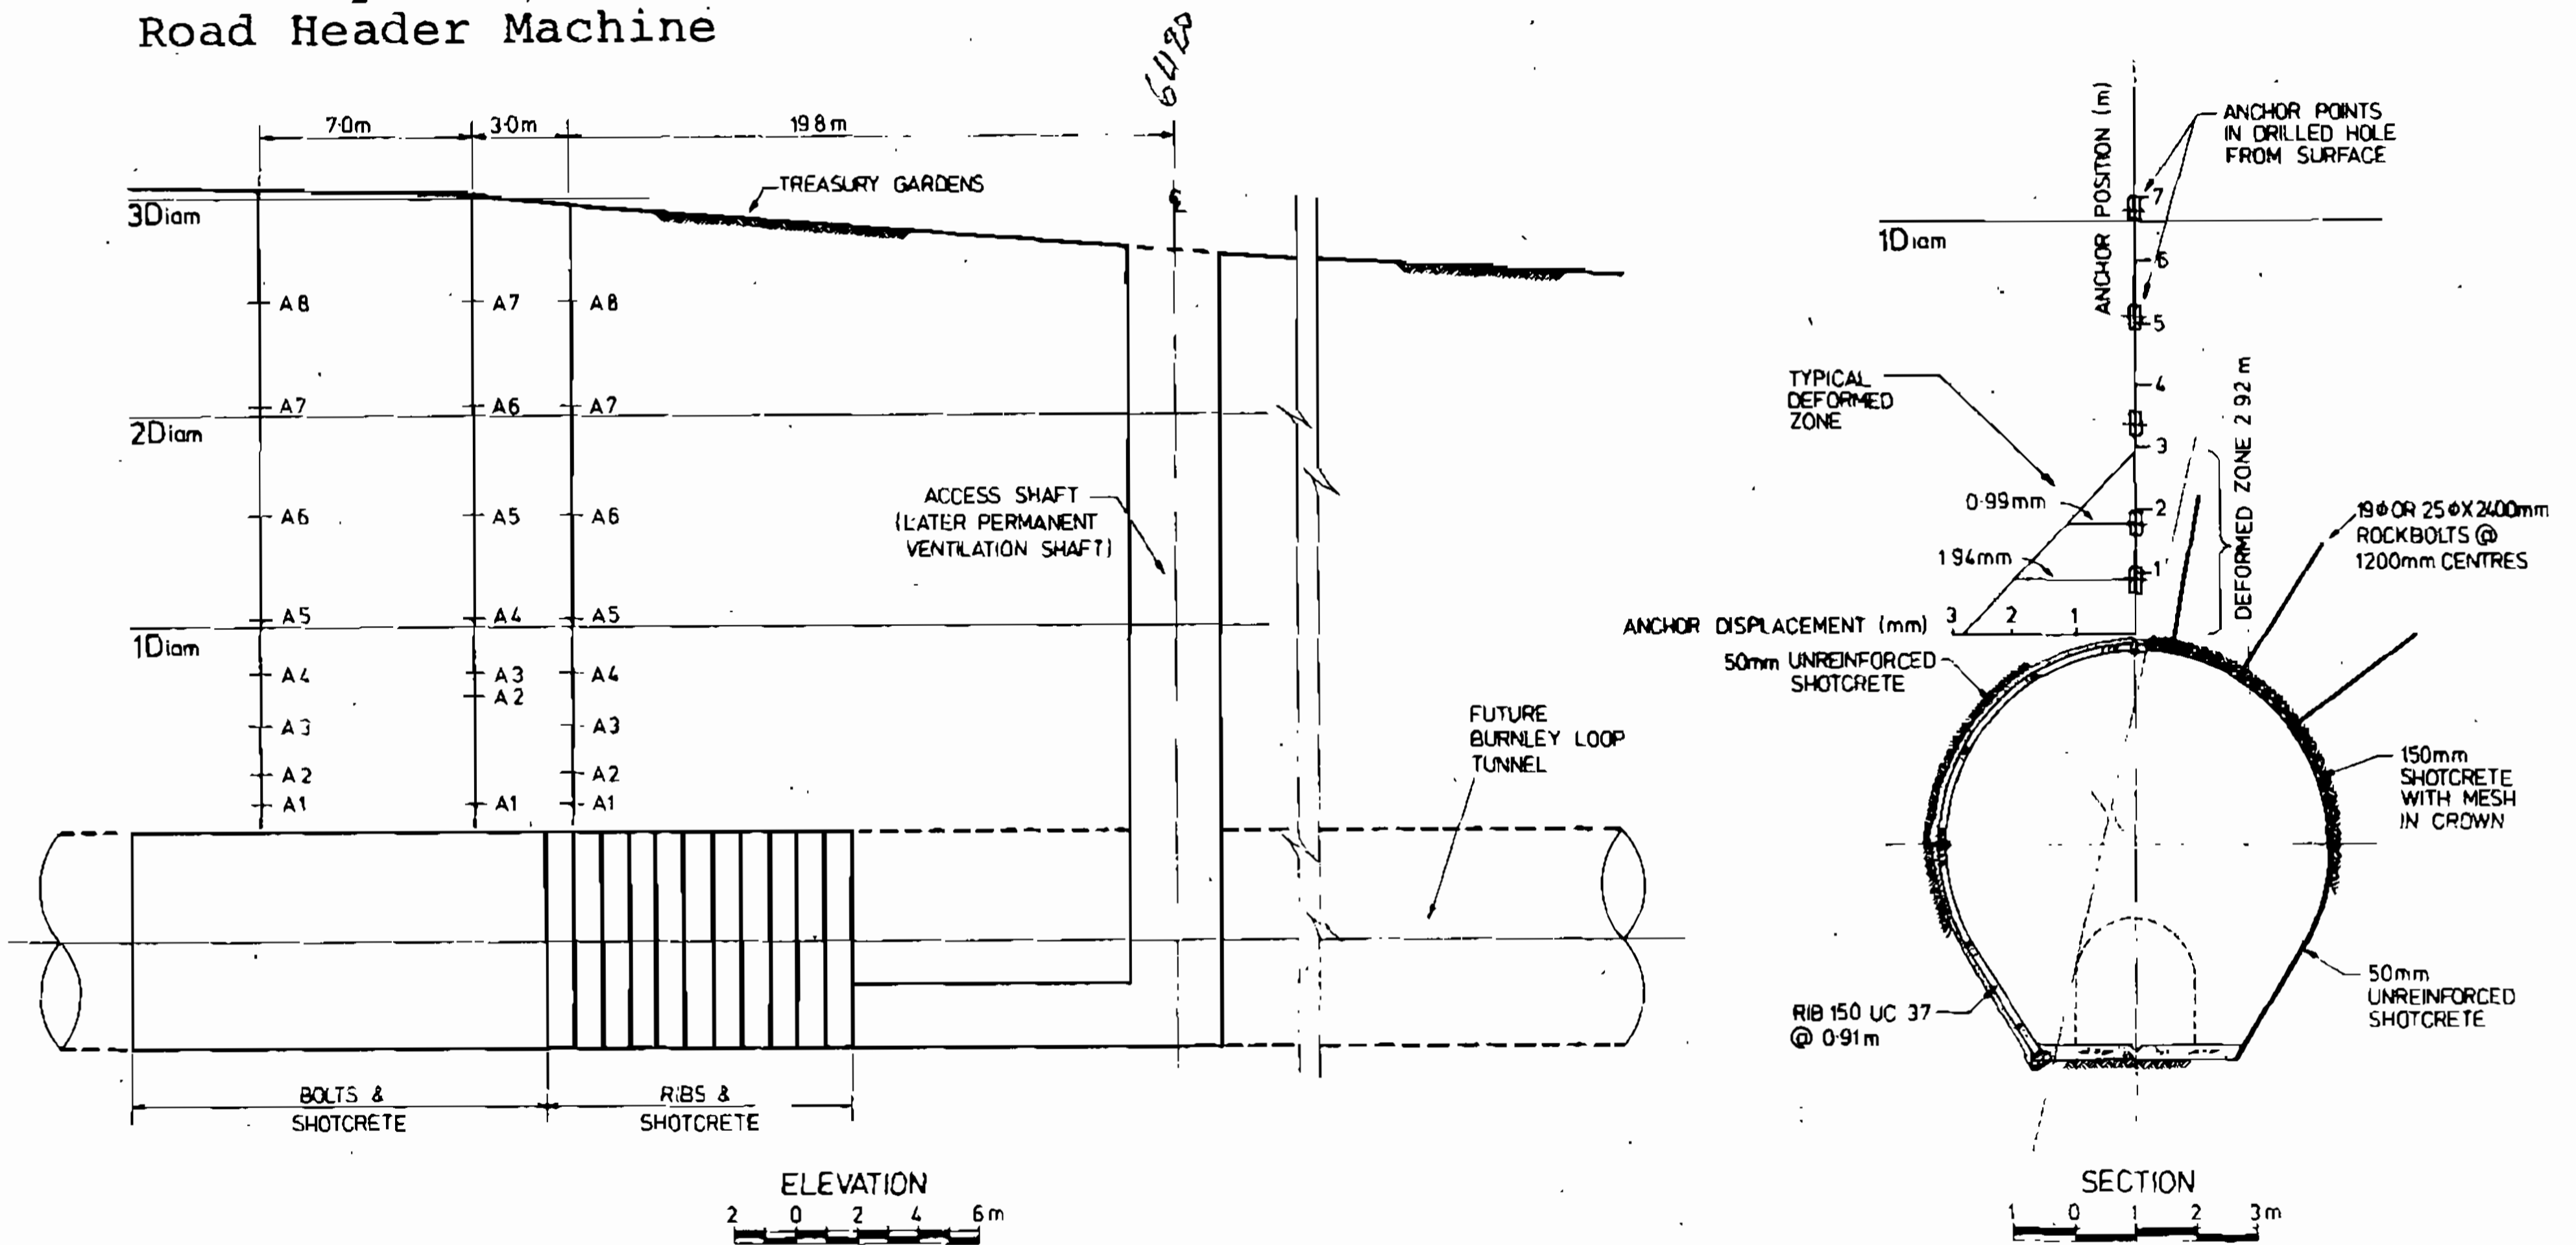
Multipoint Extensometer Installation Treasury Gardens Pilot Tunnel
